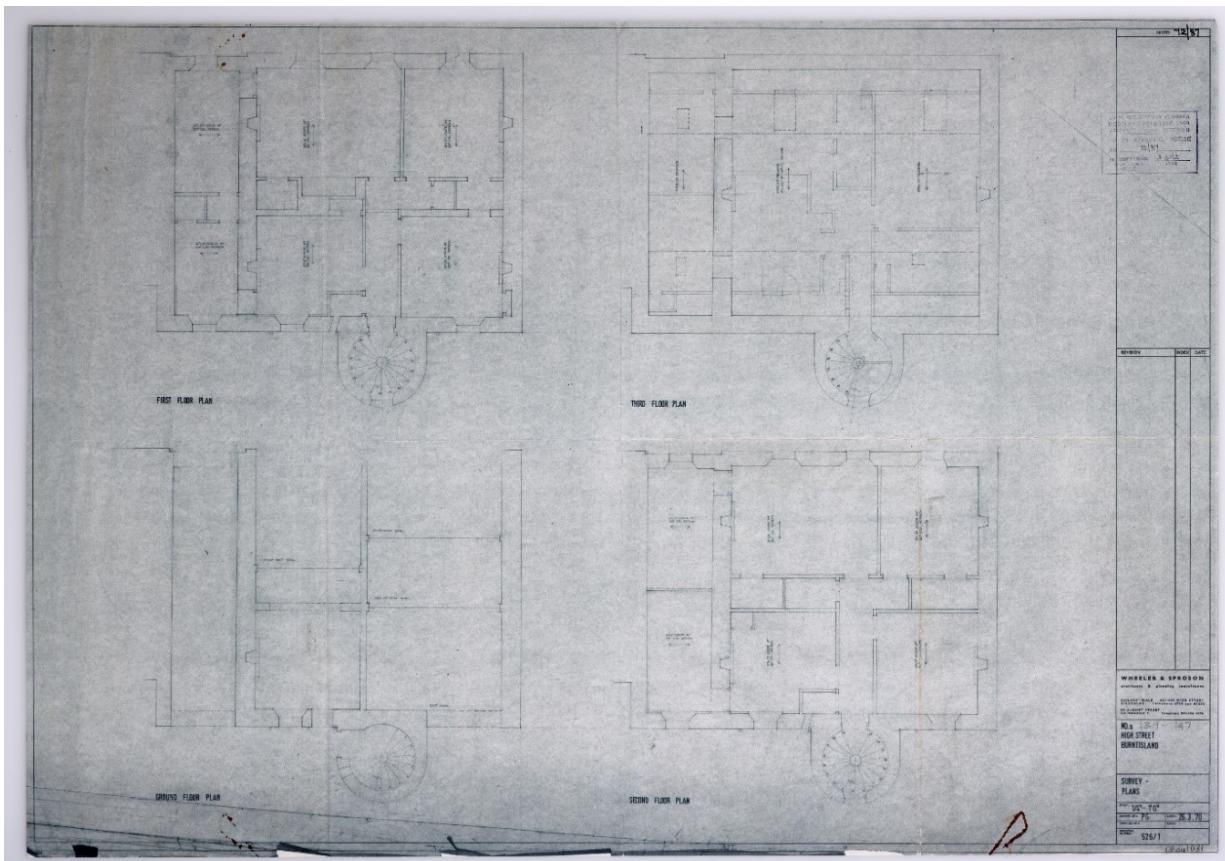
Survey floor plans for Job 526 (139/147 High Street), 26th of March 1970.
